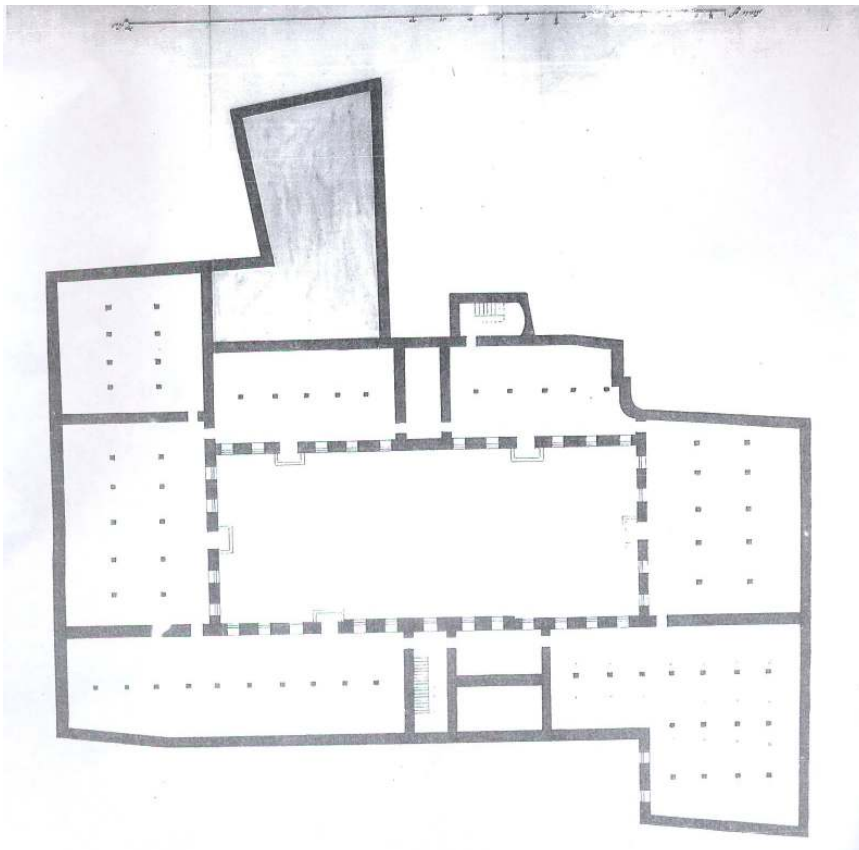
Plan of basement of warehouse, 1805 (re-oriented North)
